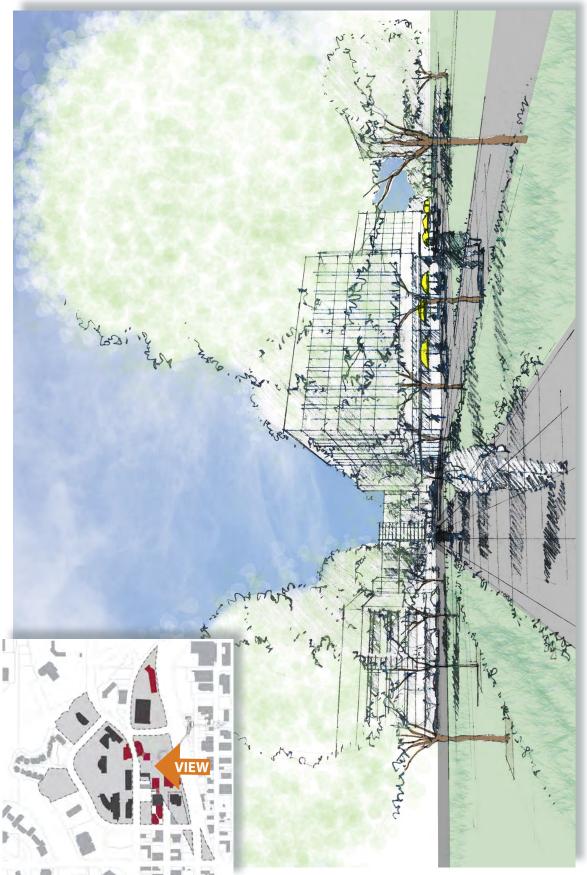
Master Plan Sketch, Looking North toward the SAC
